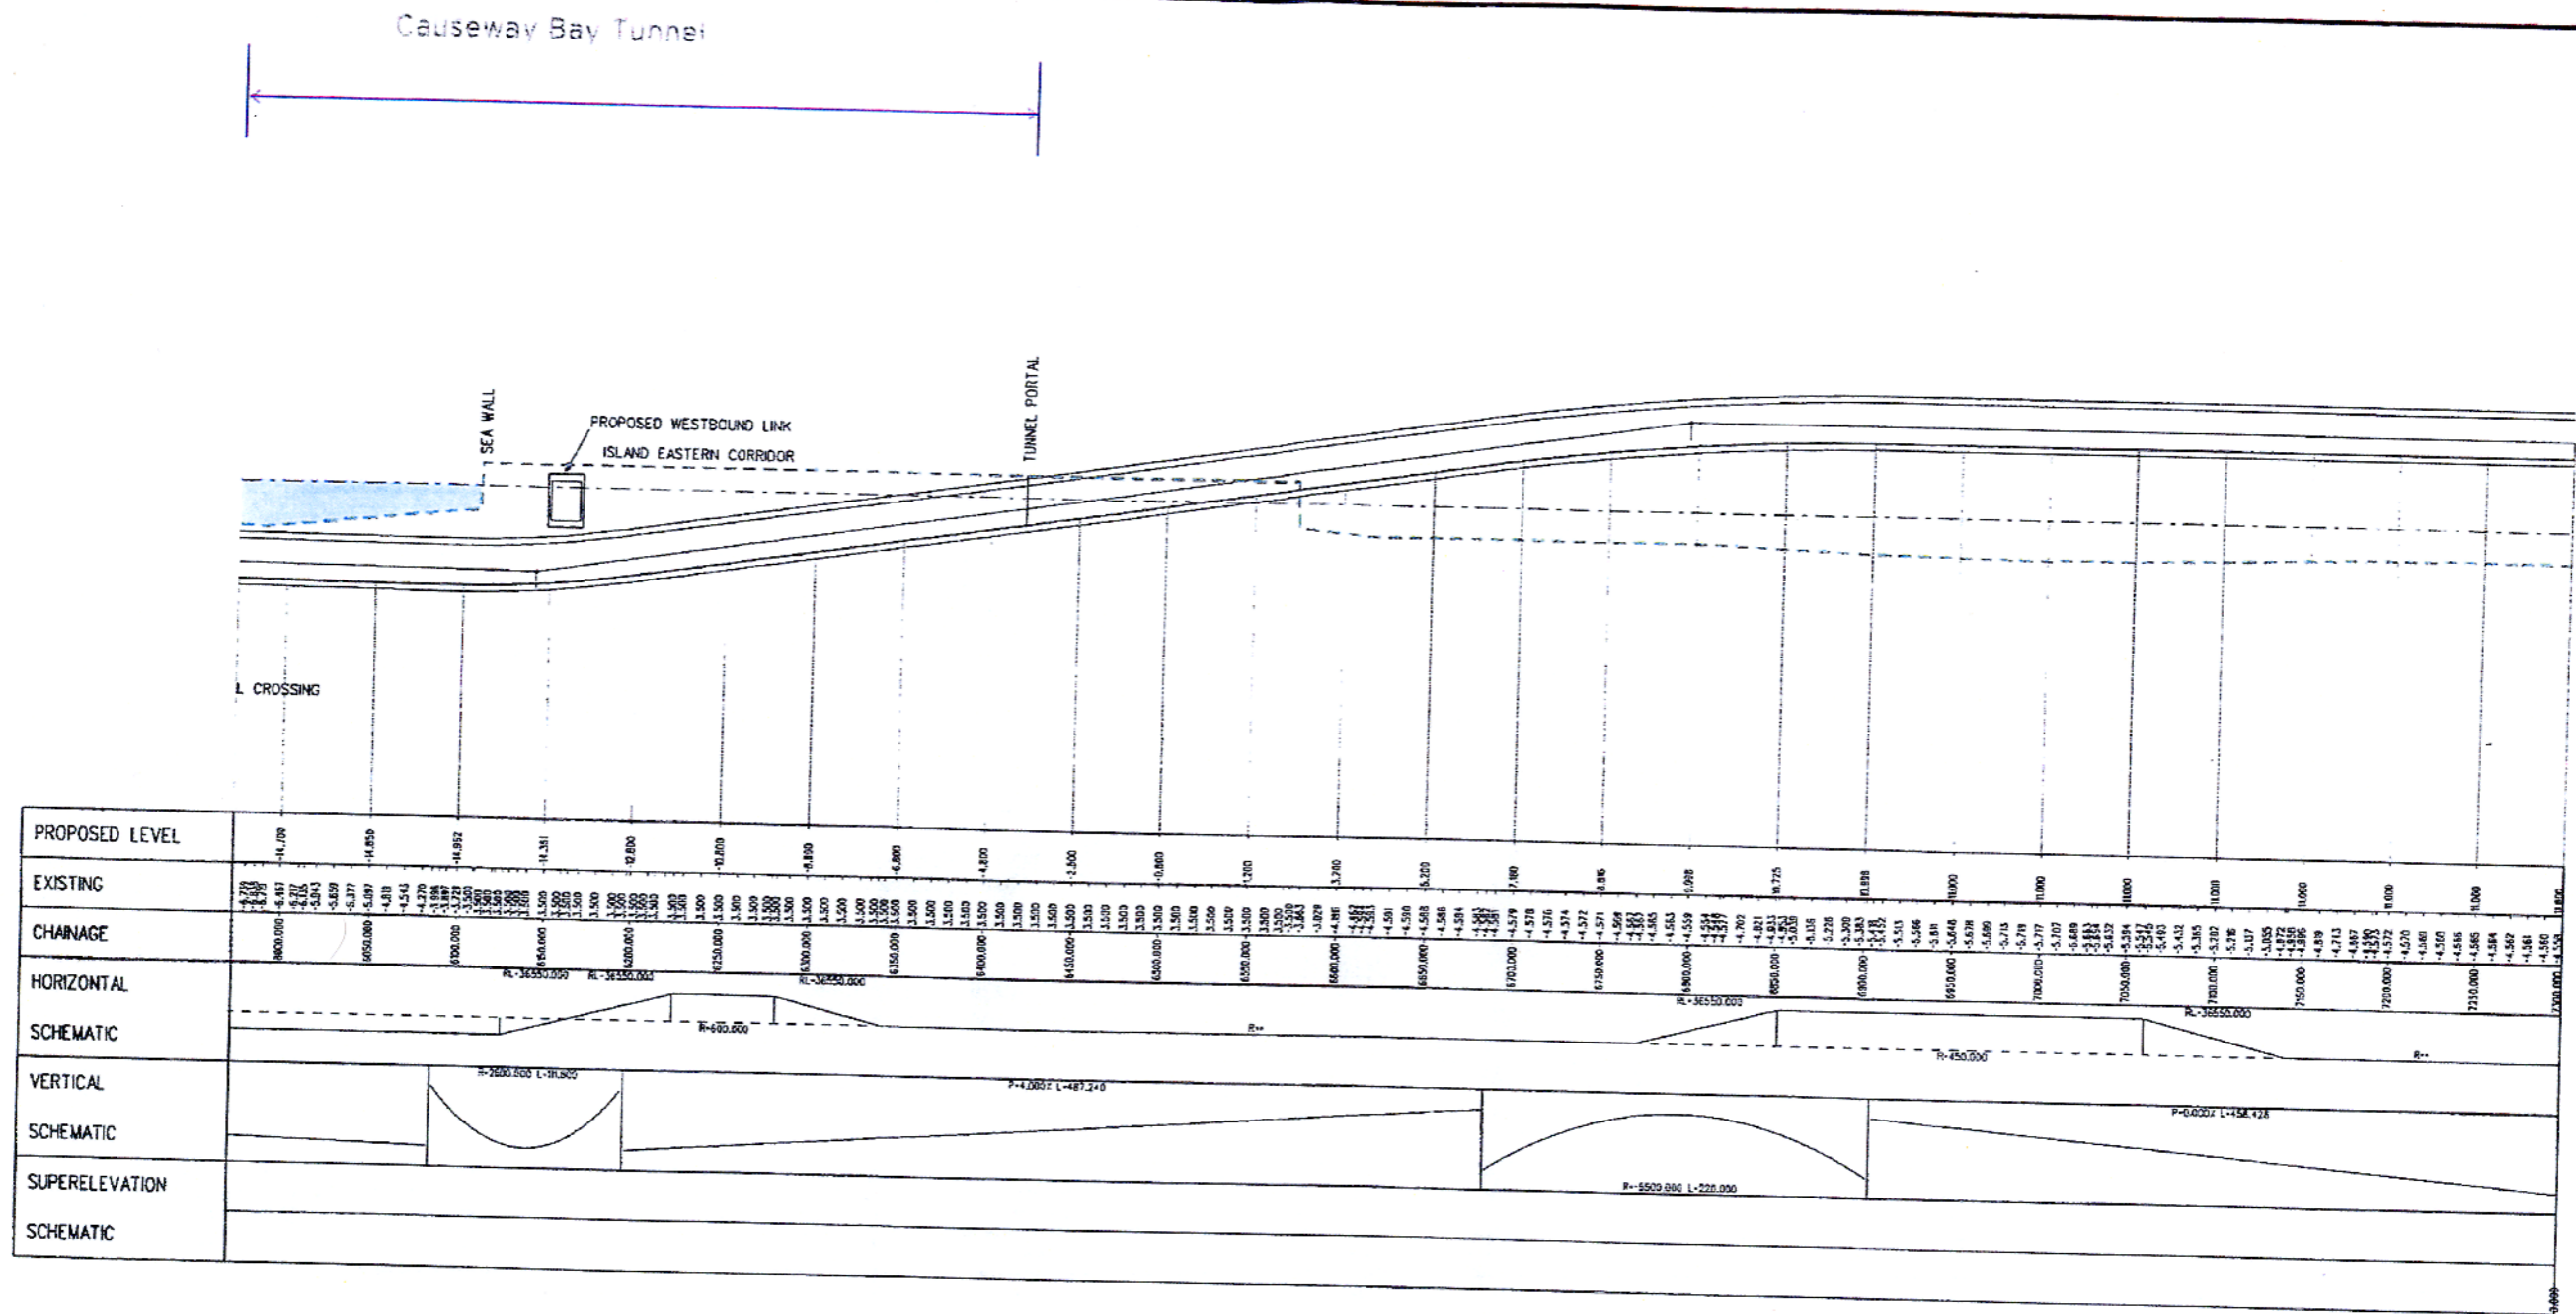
Vertical Elevation of Bypass (4 of 4)
